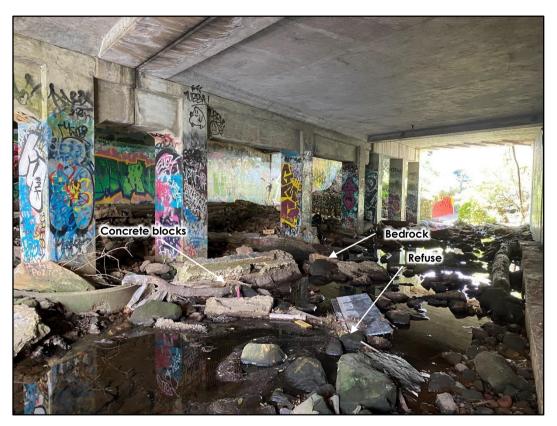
Burnt Bridge Creek below Condamine Street bridge.
